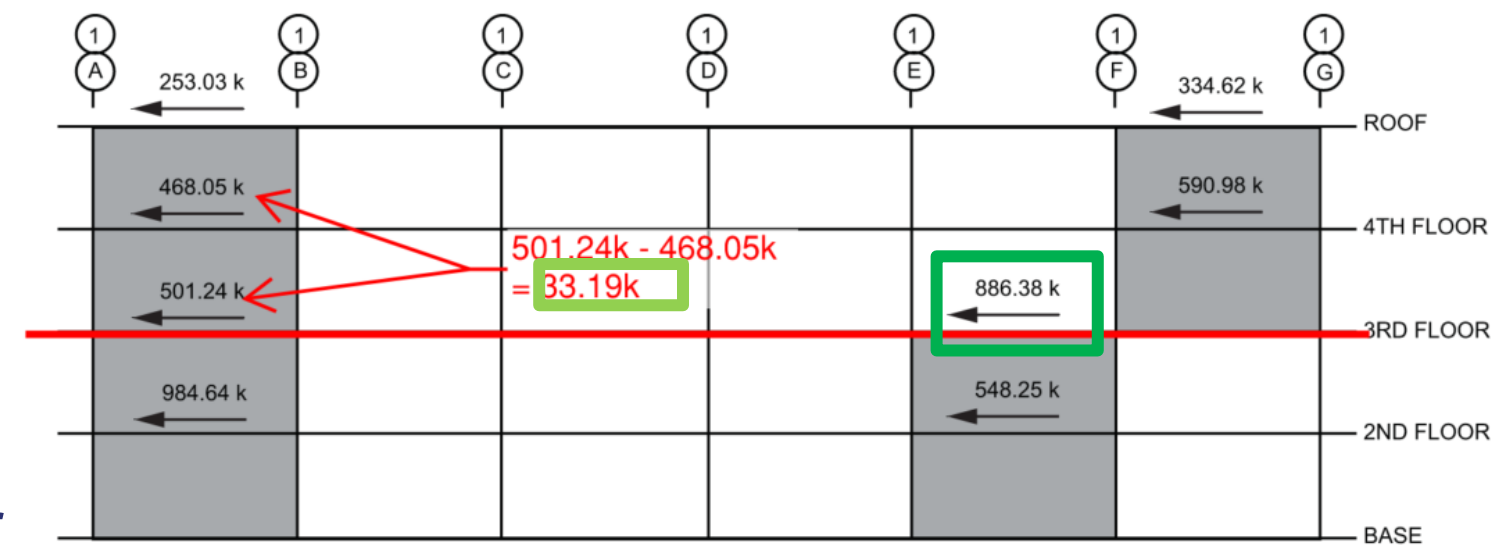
Concrete shear wall forces by level, wall on gridline 1
